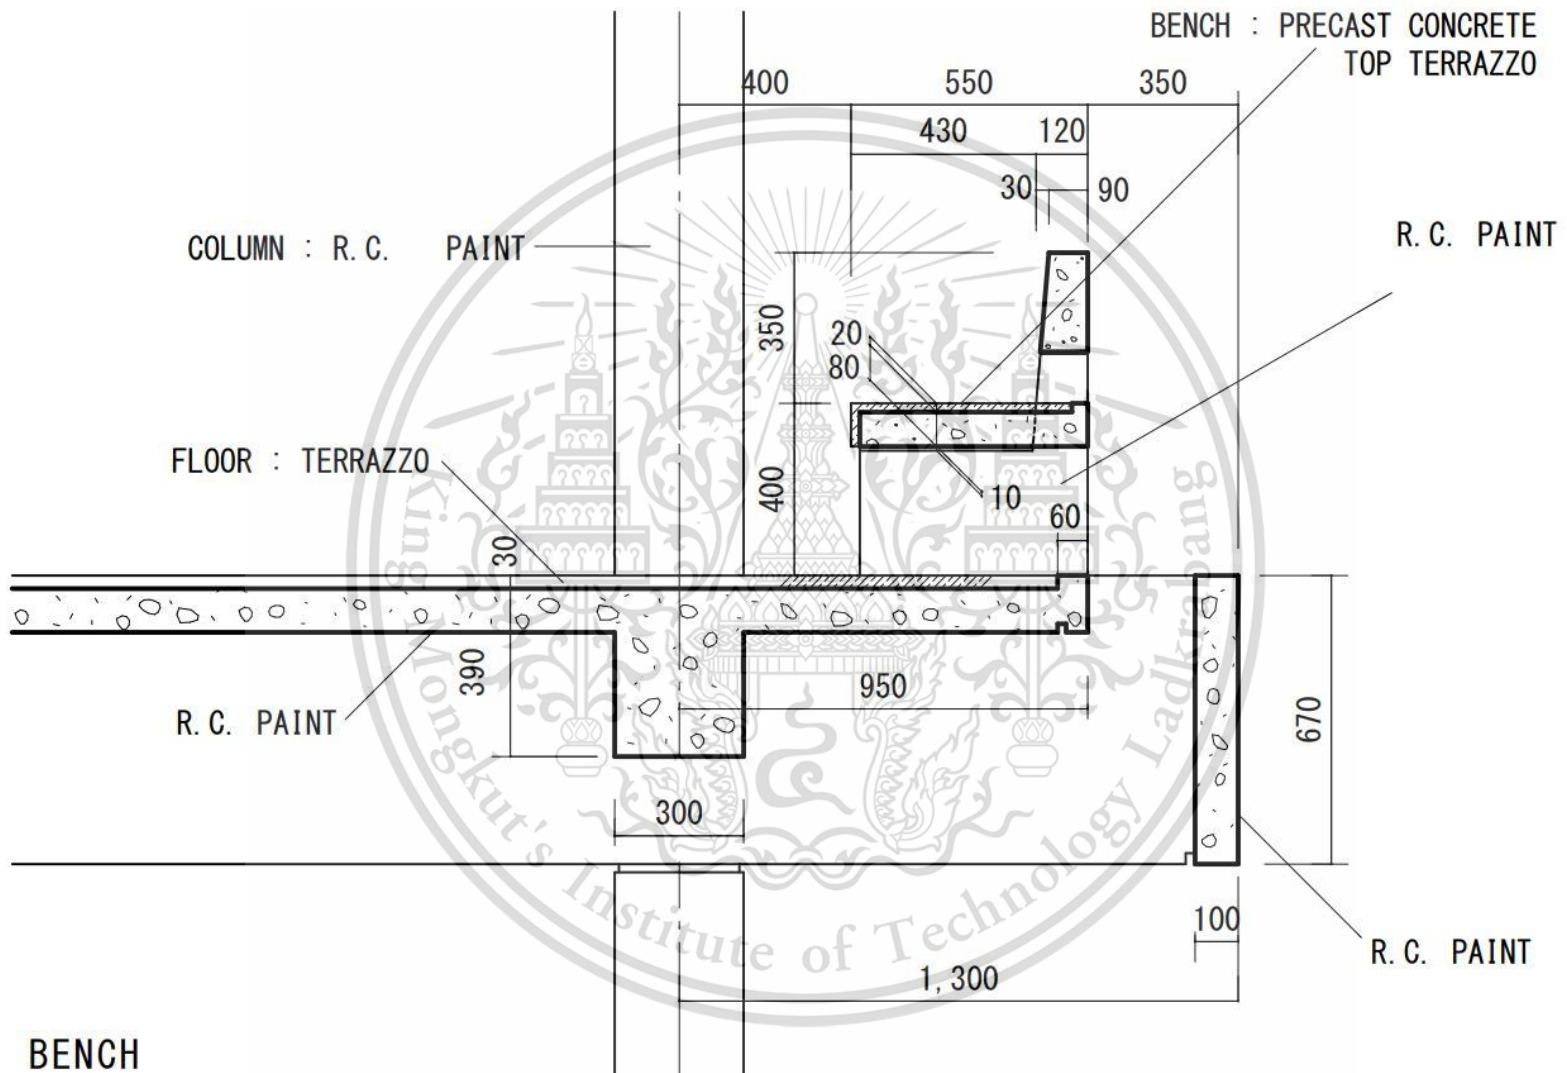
Detail of bench in Thai vocational school (Retouch of the original drawing)
